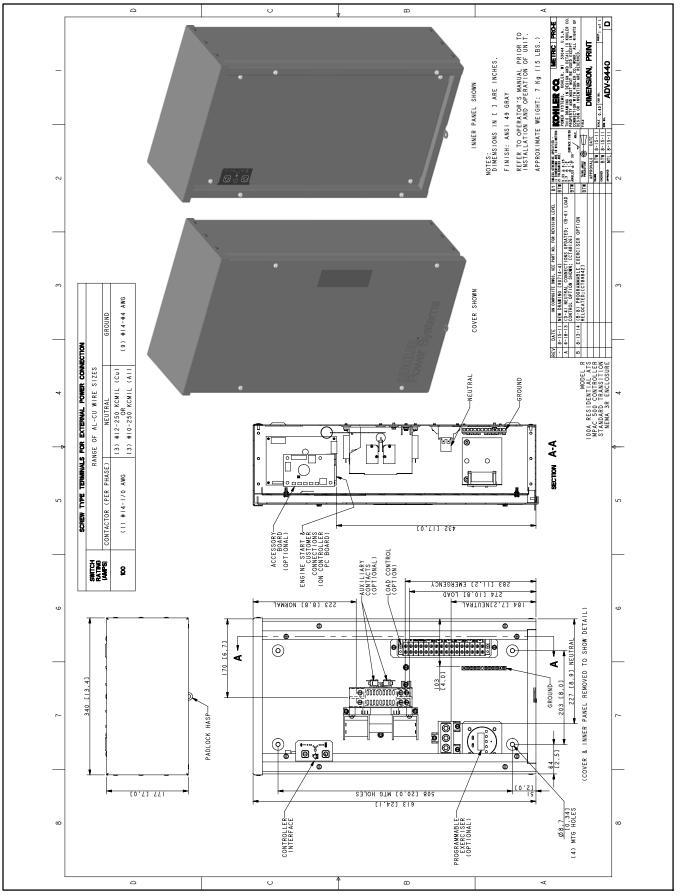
Dimension Drawing, 100 Amp NEMA Type 3R Enclosure without Load Center, ADV-8440
